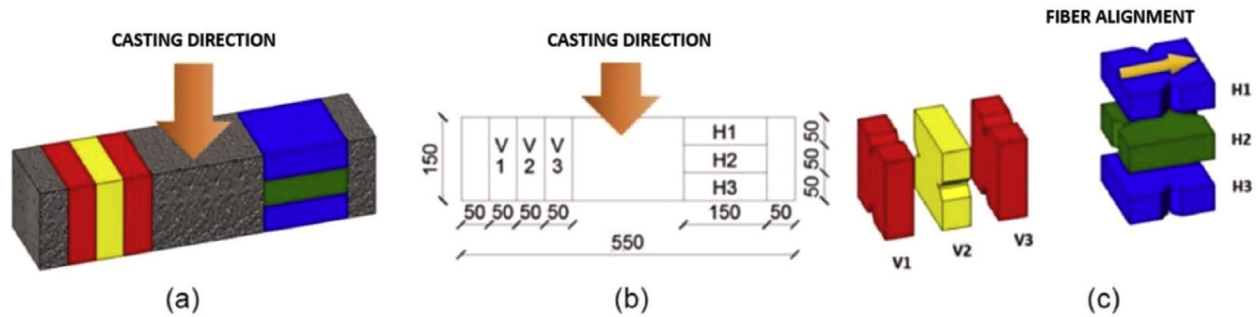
Cutting scheme to obtain specimens for DEWS tests. Dimensions in mm.
